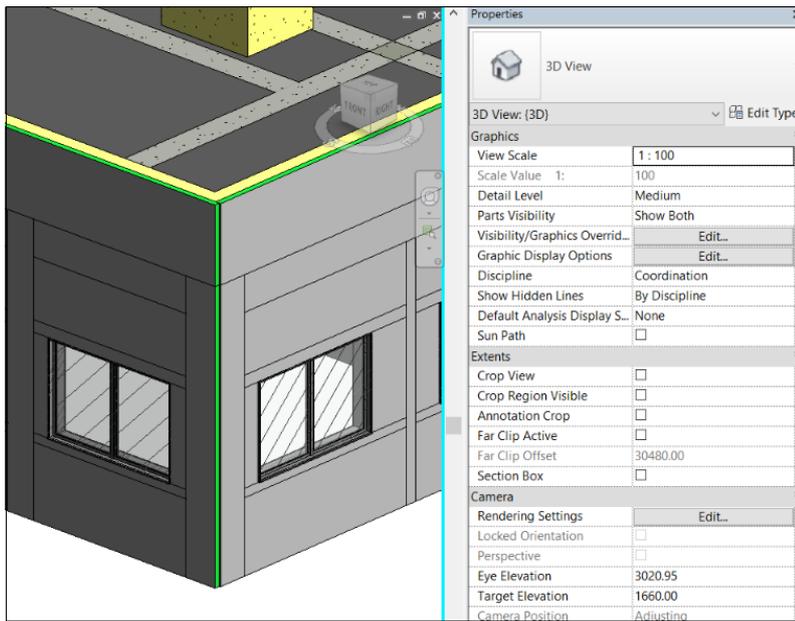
An Improper Joint of Insulation Elements in 3D Plan
